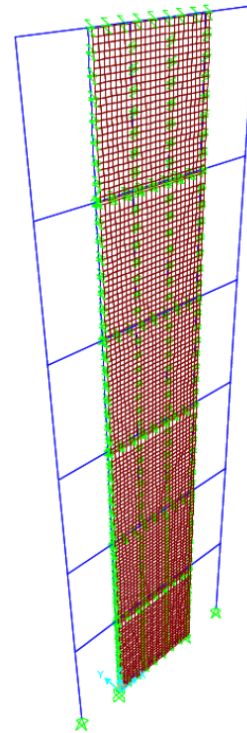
3-D view of 6-storey wall with the beam at each storey level representing the diaphragm
